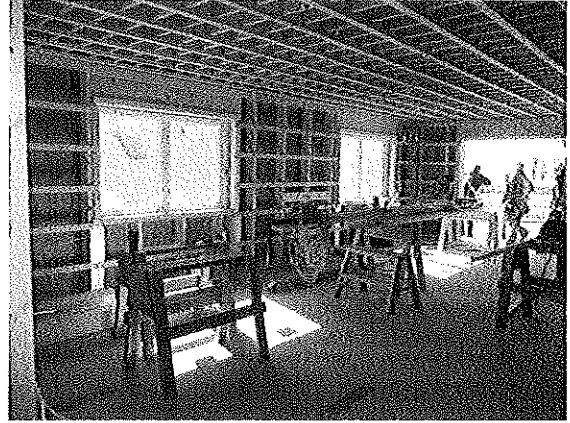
2<sup>nd</sup> Flr: View looking north
